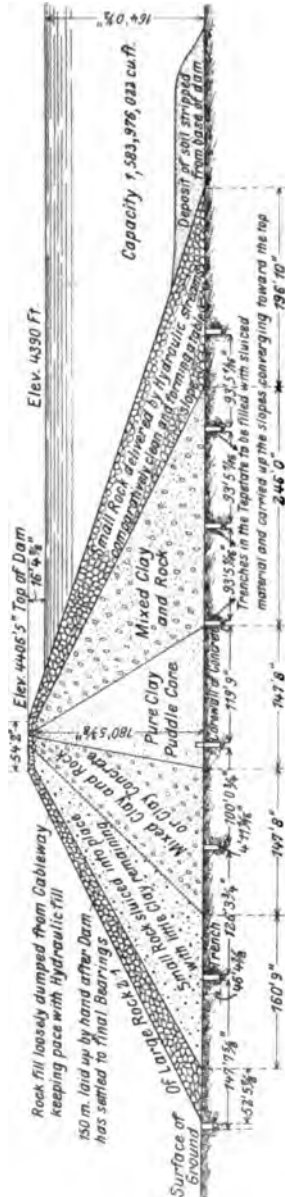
Typical Section of Necaxa Reservoir Dam.
